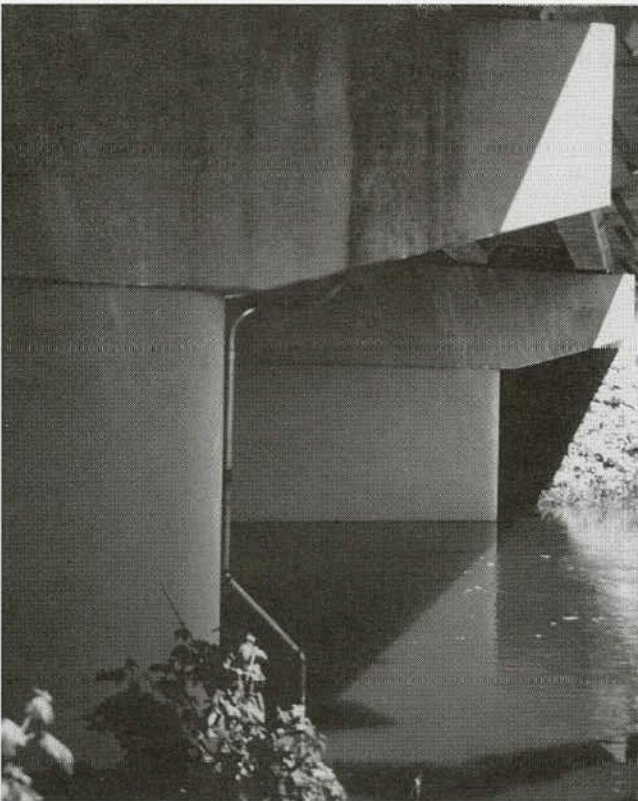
Installation of sliding collar device at Minnesota bridge no. 74004 (Site MN1).
